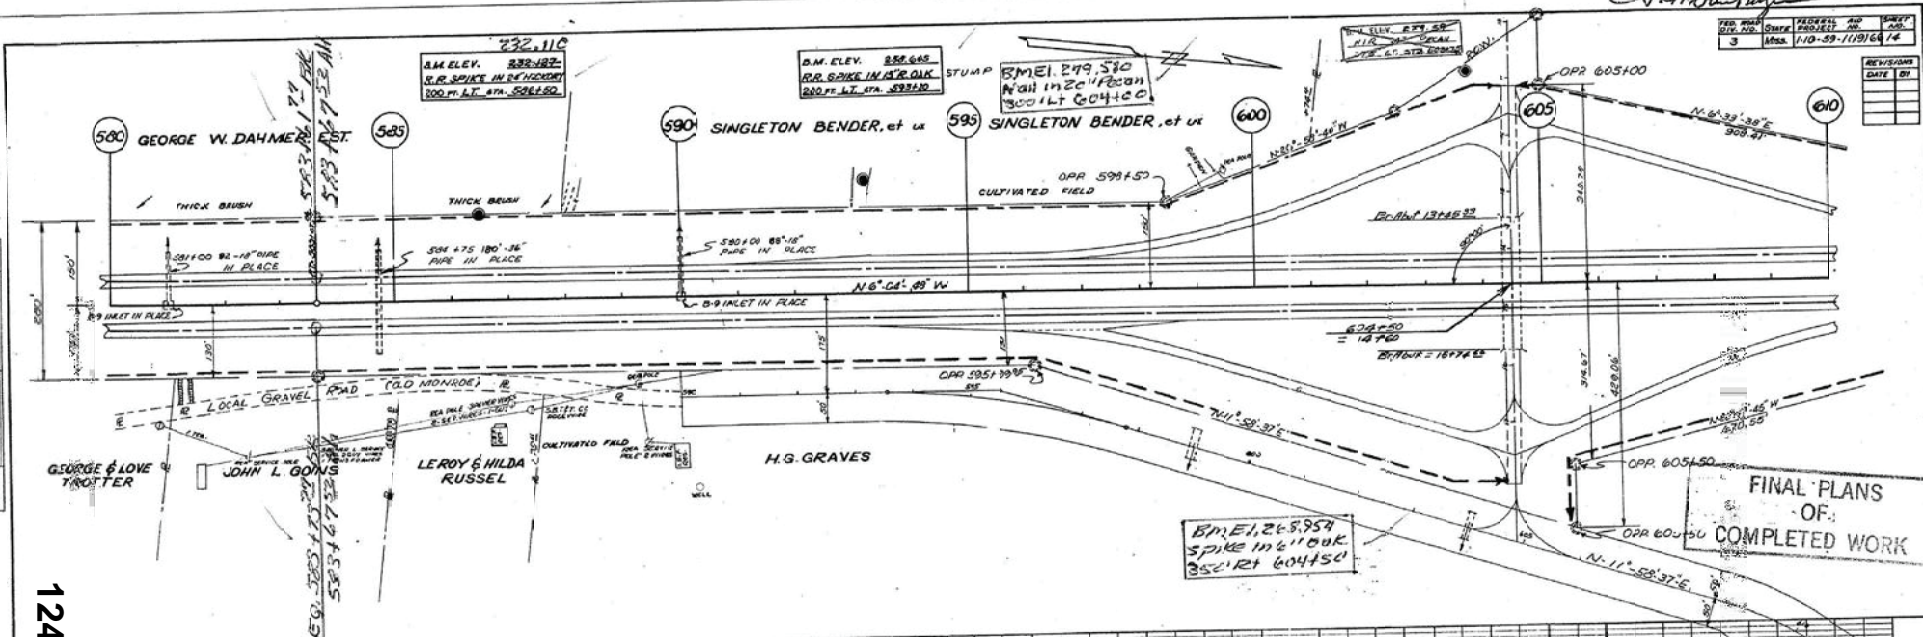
PLAN, PROFILE, O.P.R. & E.C. SHEET
